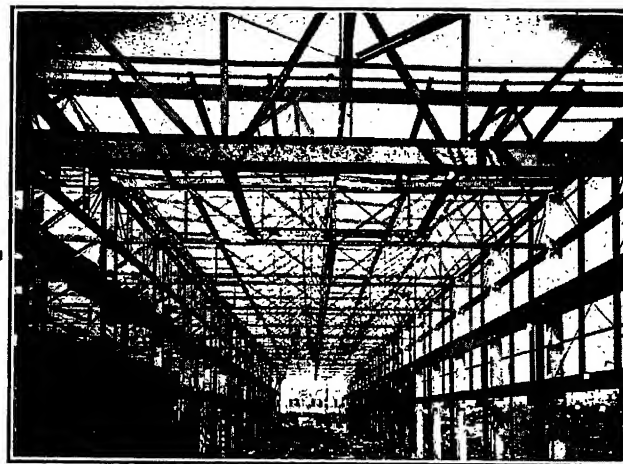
SHOWING BUILDING WITH 56-ARC-WELDED ROOF TRUSSES OF GENERAL ELECTRIC CO. AT WEST PHILADELPHIA, PA.
